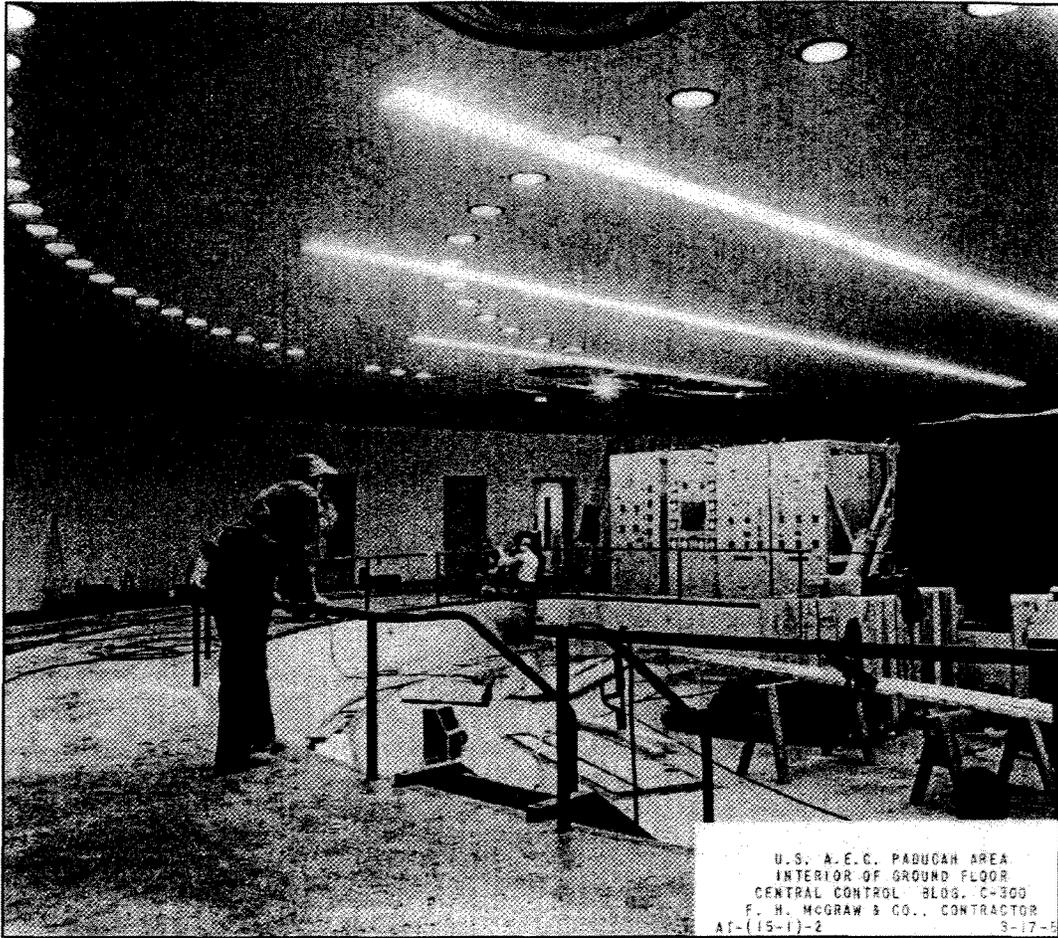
Installation of control panels in Building C-300 in March 1953.
